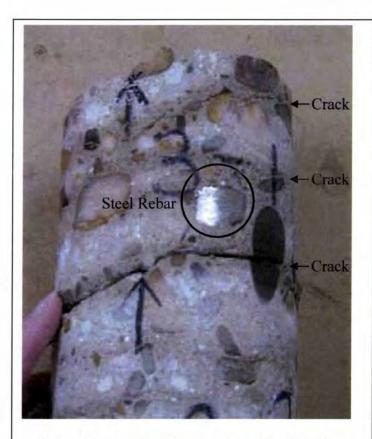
Core 3, Segments 1 and 2 - Cracking shows that concrete was likely placed in lifts.
